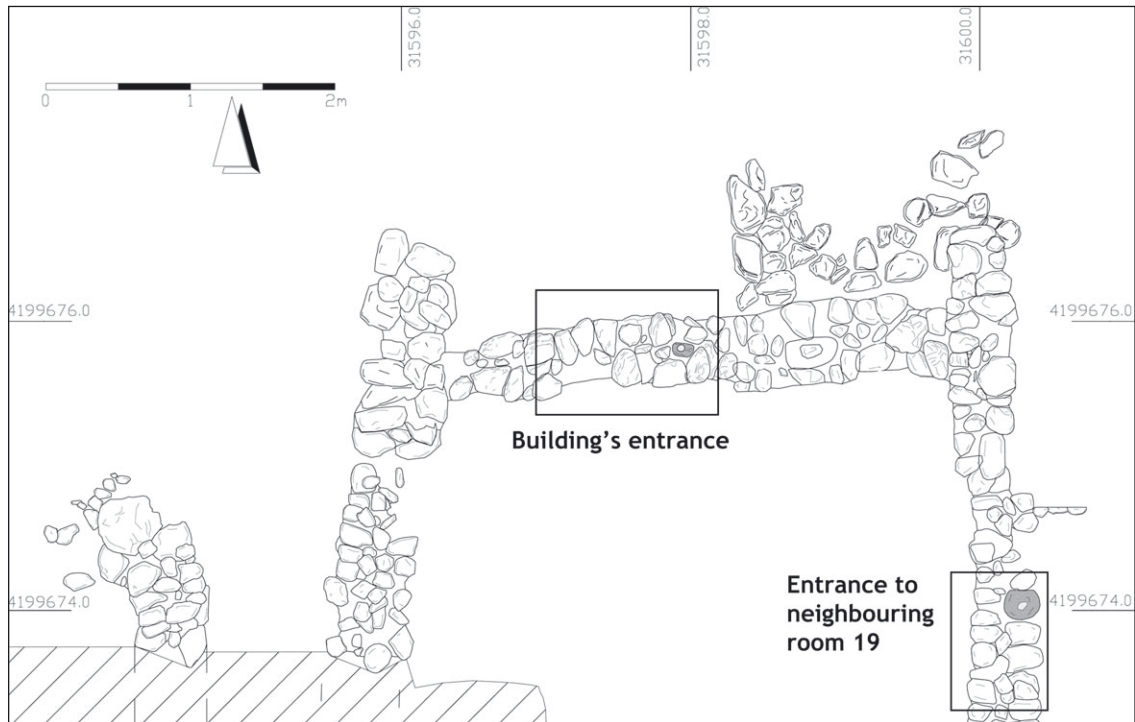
Plan showing entrances into the room, which are assumed due to hinge stones built 'inside' the stone plinths of the walls
